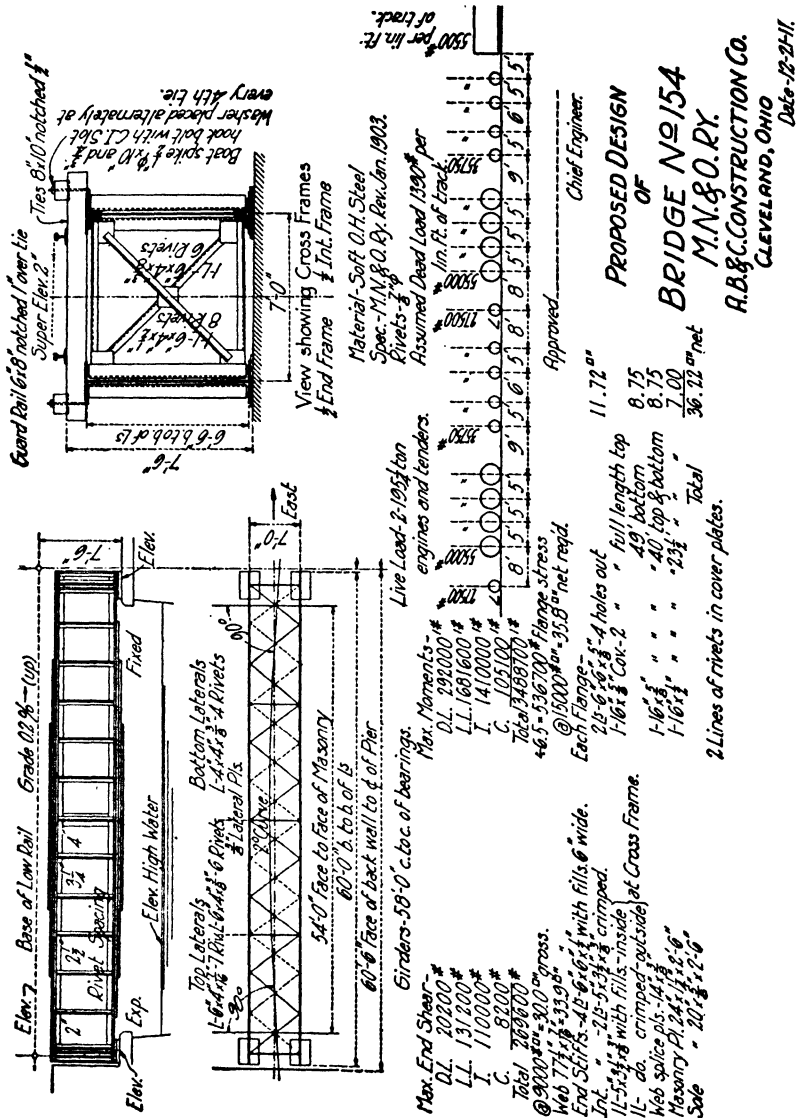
STRESS SHEET FOR DECK PLATE GIRDER SPAN.
